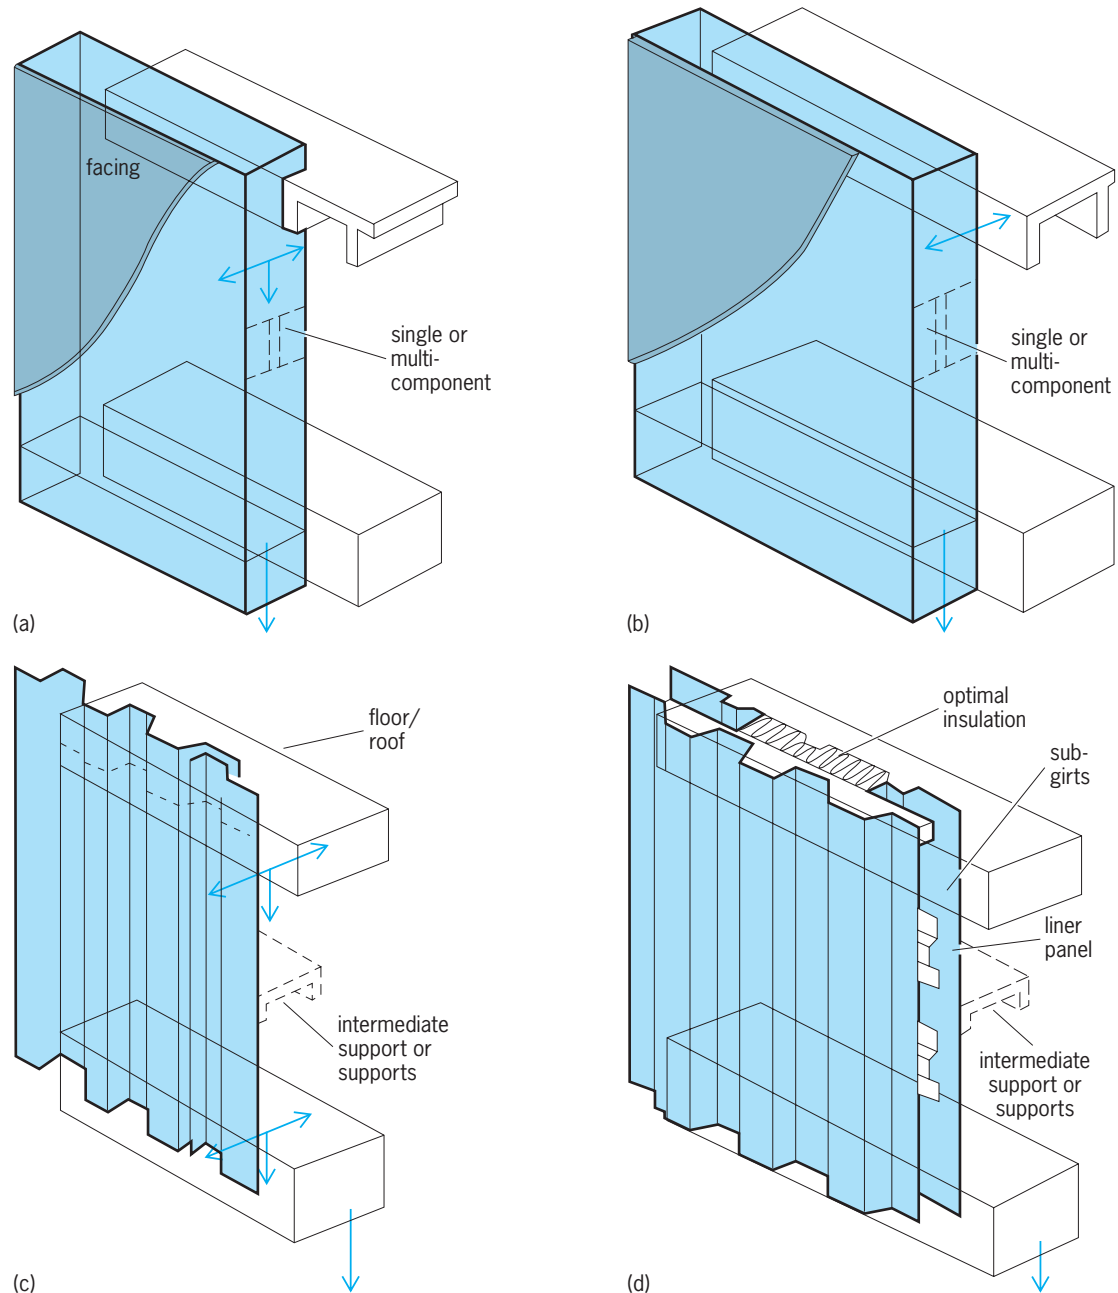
Basic bearing- and curtain-wall construction. Arrows refer to force vectors, such as vertical dead loads, or horizontal wind loads. (a) Bearing wall. (b) Nonbearing (but self-supporting) wall. (c) Formed metal curtain wall, single thickness. (d) Formed metal sandwich curtain wall. (After Sweets Catalog File: General Building and Renovation, 1993)
